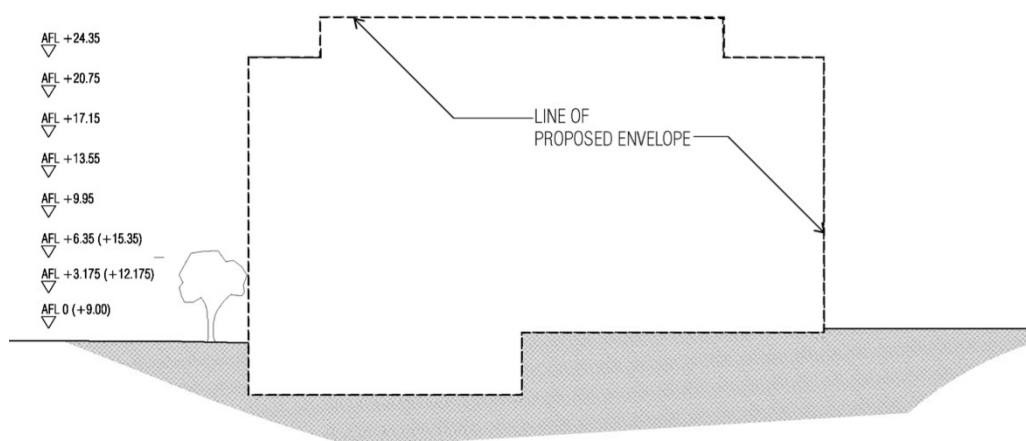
Extract from the architectural plans showing the proposed envelope in section
